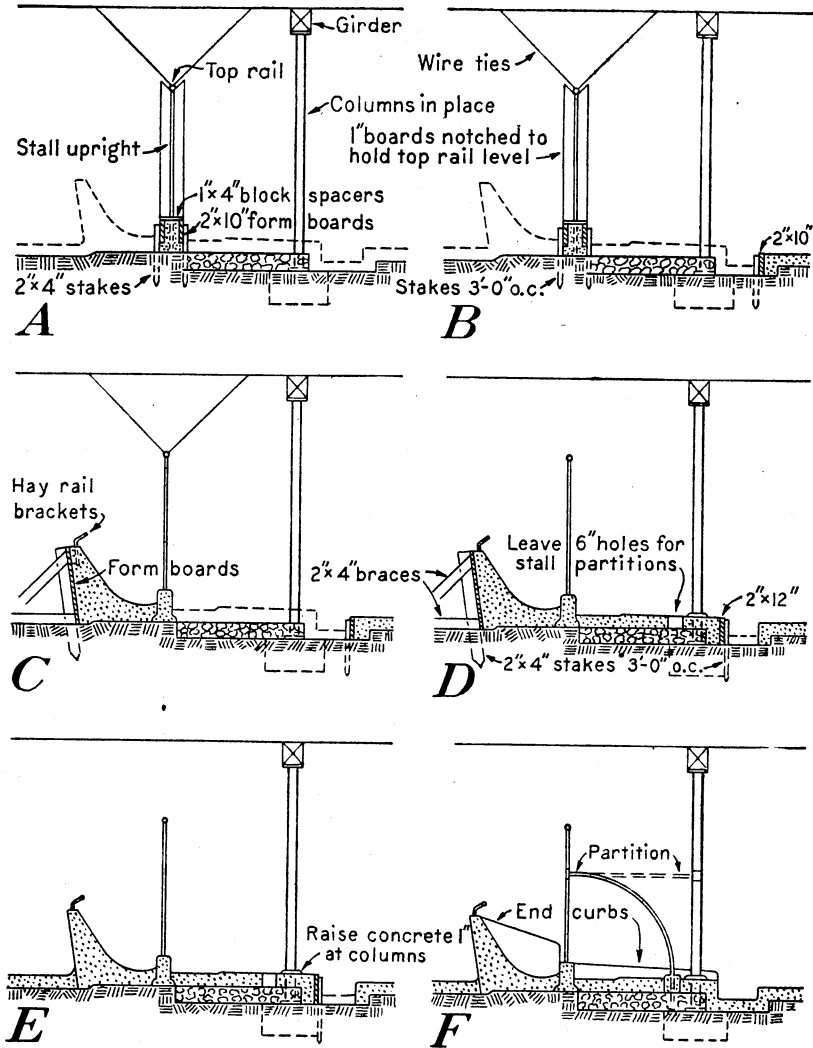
Steps in building a concrete floor in a cow barn: A, Stanchion curb is built first, with all stanchion anchors set; B, litter alley is built while stanchion curb hardens; C, curb forms are removed, and manger is built with hay-rail brackets set; D, standing platform is built while manger hardens; E, manger forms are removed and feed alley is built; F, gutter and end curbs are built, and stall partitions are grouted in.
